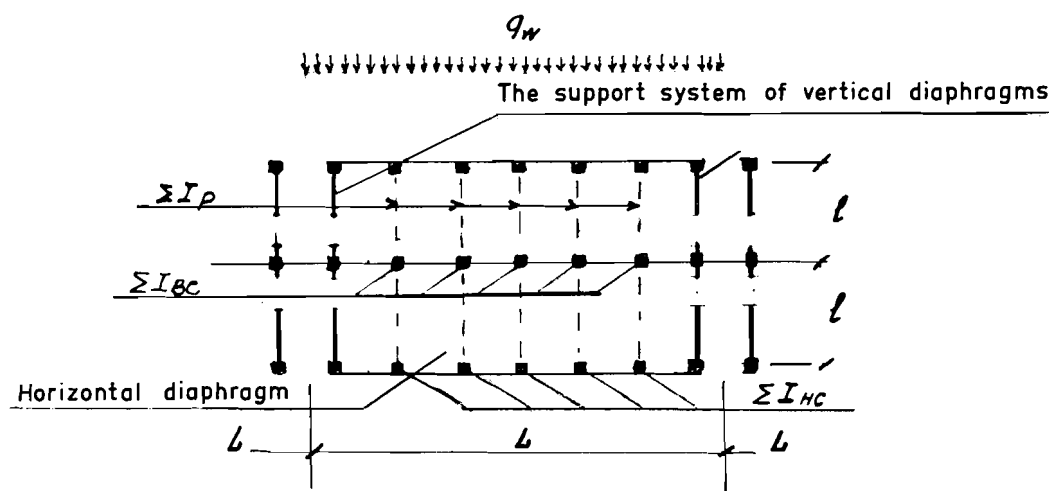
Standard section of a frame-and-panel building with through vertical rigidity diaphragms.
